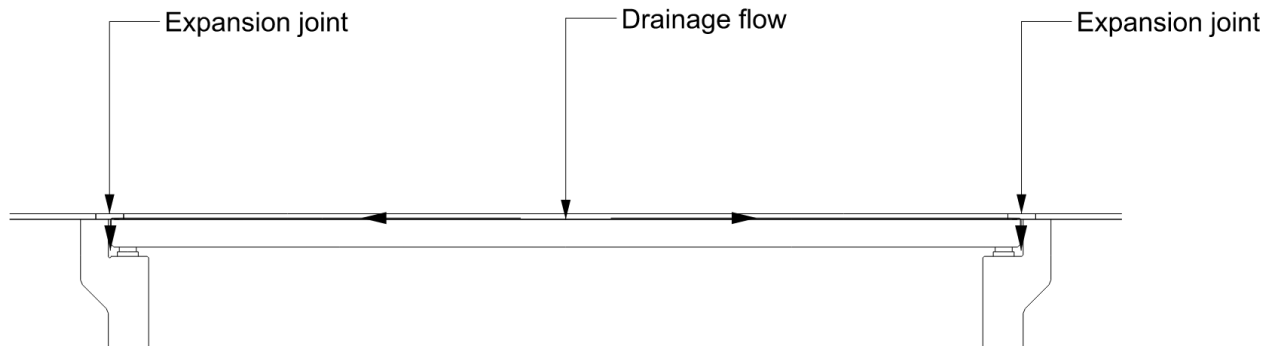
Schematic illustration for sub-surface drainage into the abutment bearing shelf
